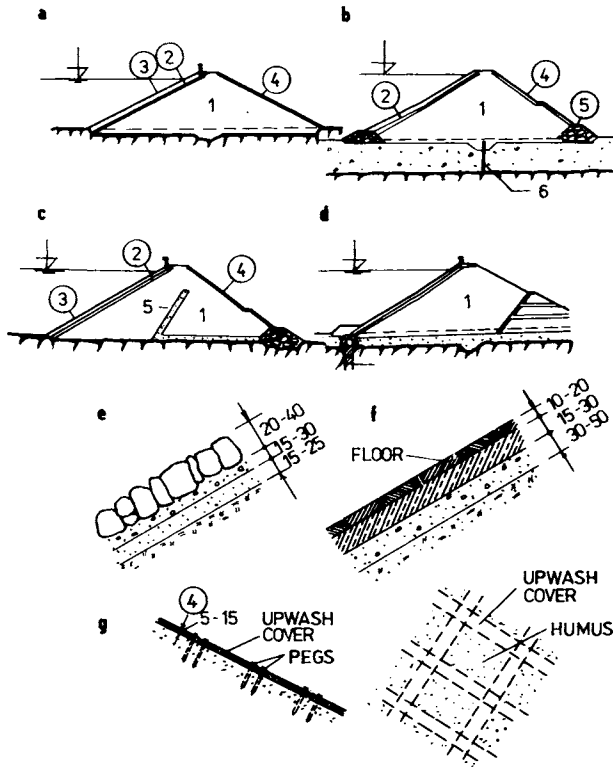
Cross-section and slope protection. a — homogeneous dam on impermeable sub-base with protecting pavement, b — dam on permeable sub-base sealed by sheet piling, c — with inside filter-drain, d — with sandwich filter layers on the downstream toe, e — upstream rocky pavement with filter layers, f — articulated concrete pavement, g — downstream slope protection by humus cover; 1 — dam body, 2 — gravel seam, 3 — pavement of upper slope, 4 — protection of downstream slope, 5 — filter (drain), 6 — sheet piling.
